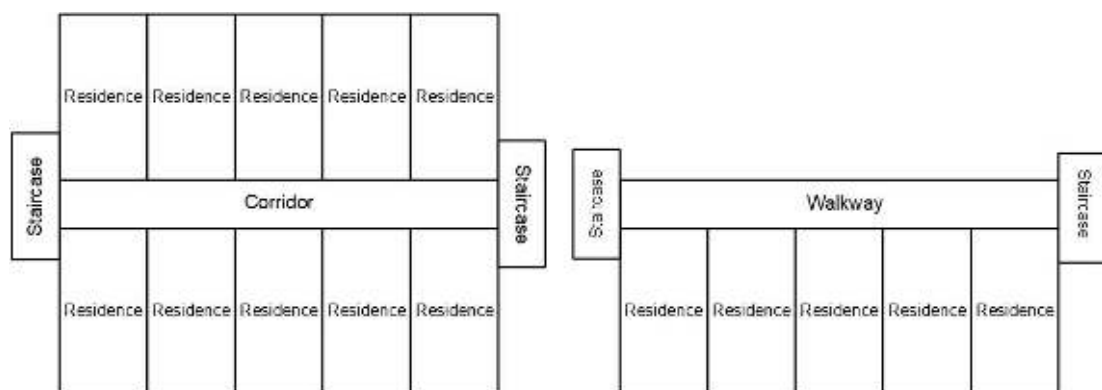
Floor plan of a residential building with internal corridors (on the left) and a building with deck access flats with enclosed walkways (on the right)
